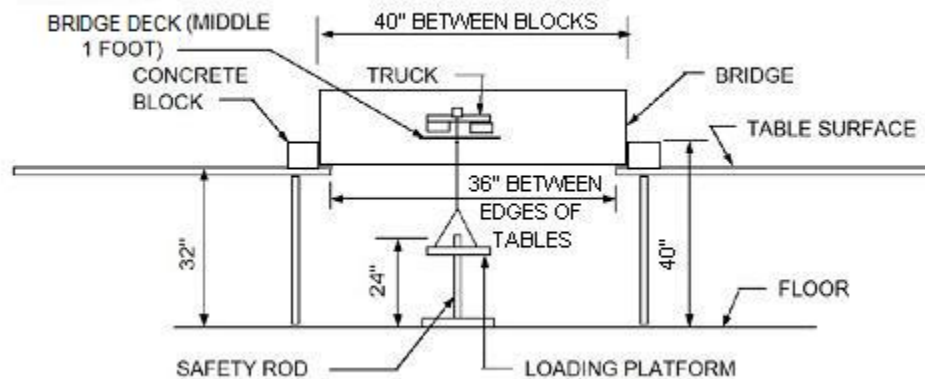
Sketch of Bridge with Roadway Surface through Bridge
